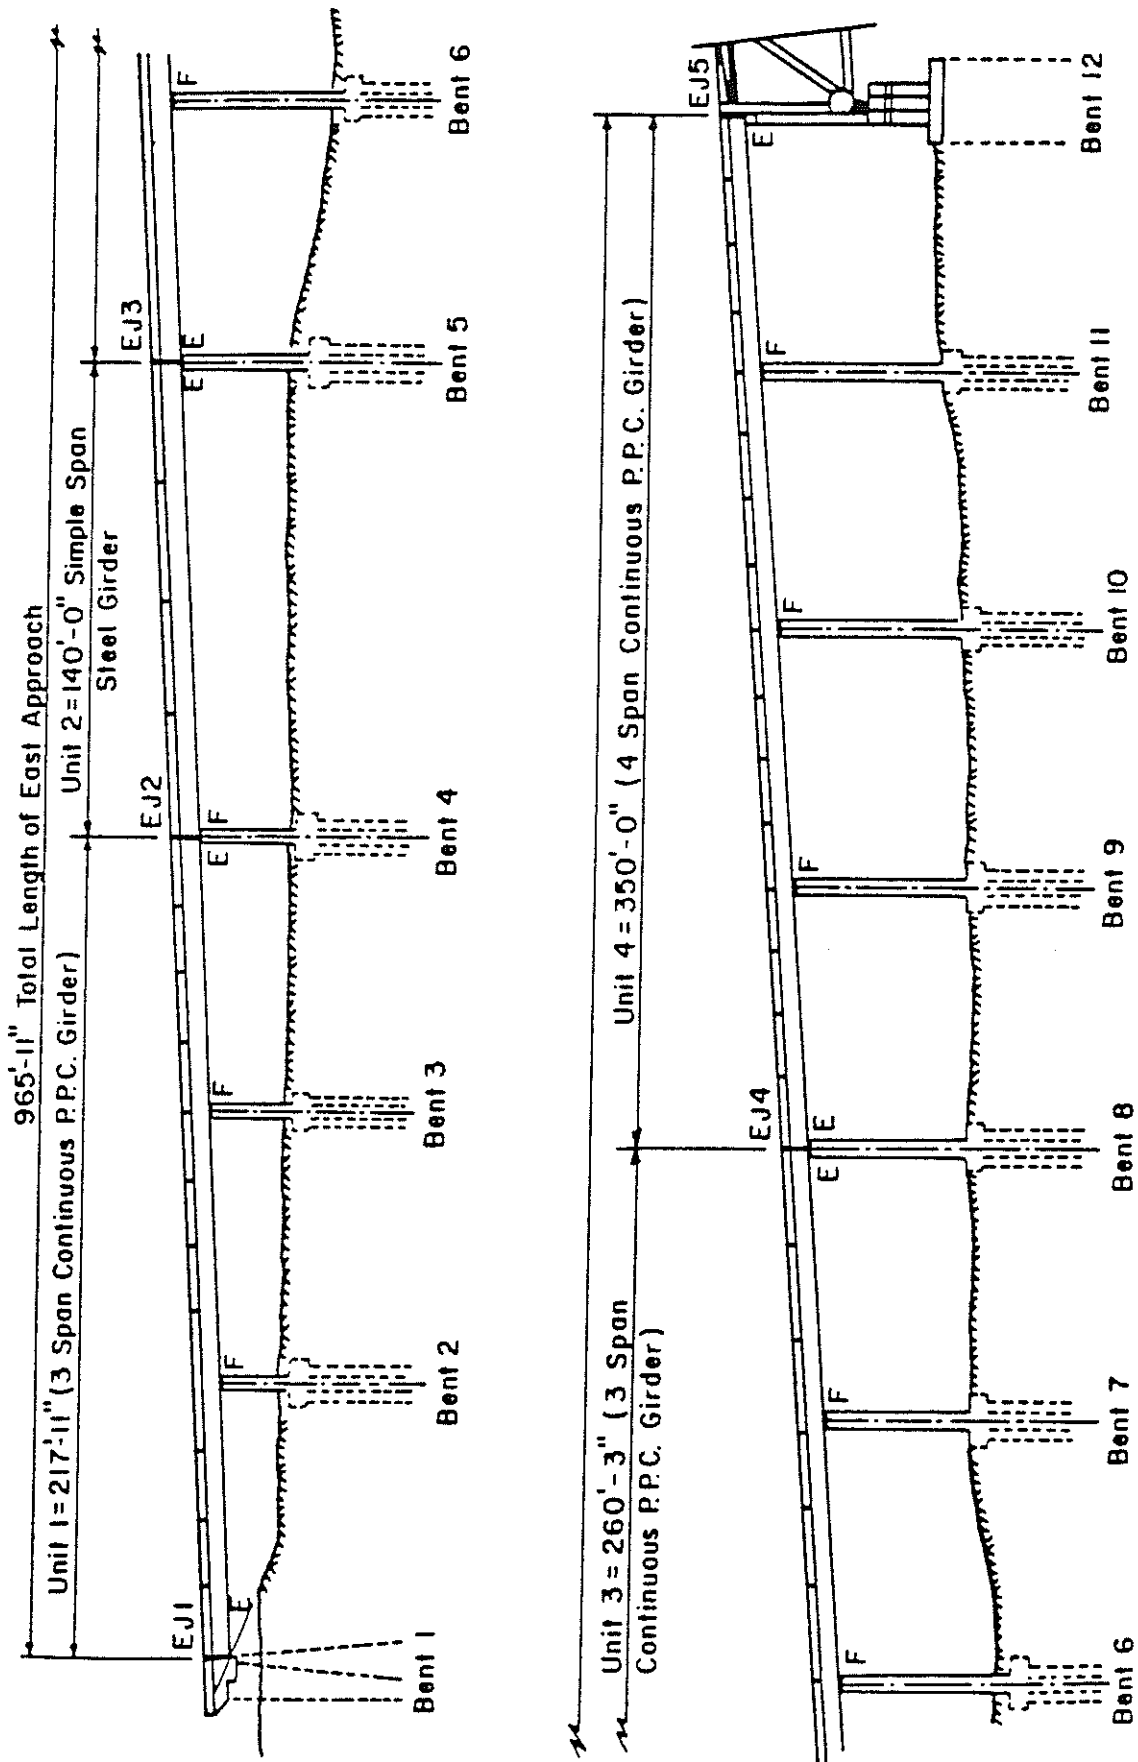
North Elevation of the East Approach of the U.S. 190 Bridge at Krotz Springs, La.
